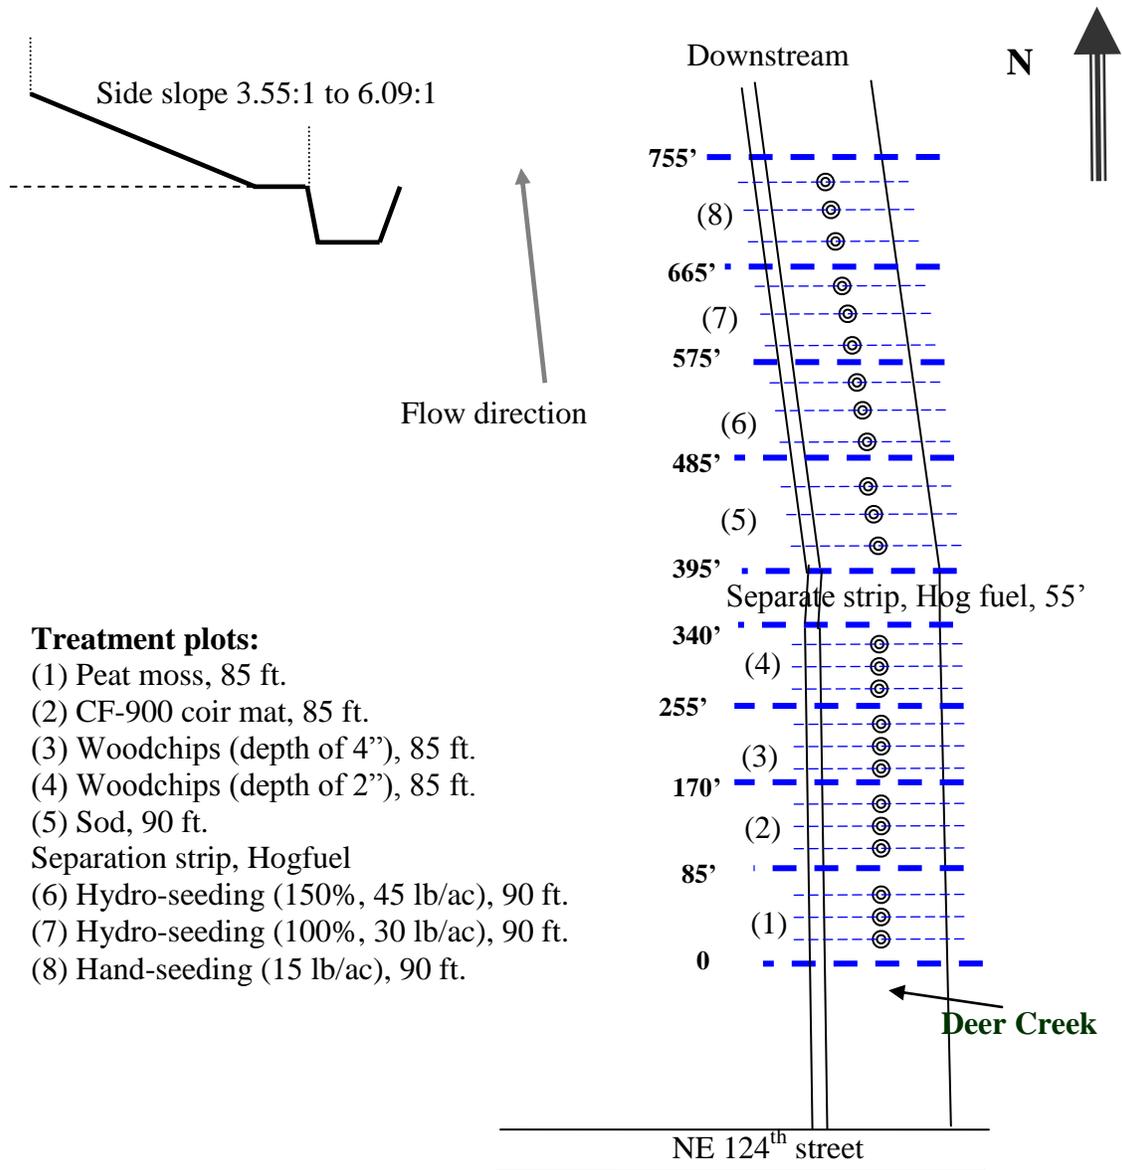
Steel rod placements at 124<sup>th</sup> Street site
